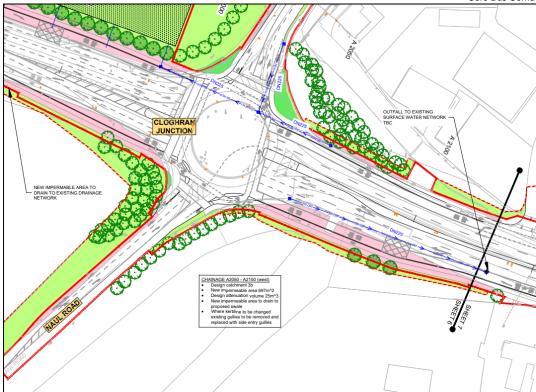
Proposed Surface Water Drainage Works at Parfit (Sheet 06)
